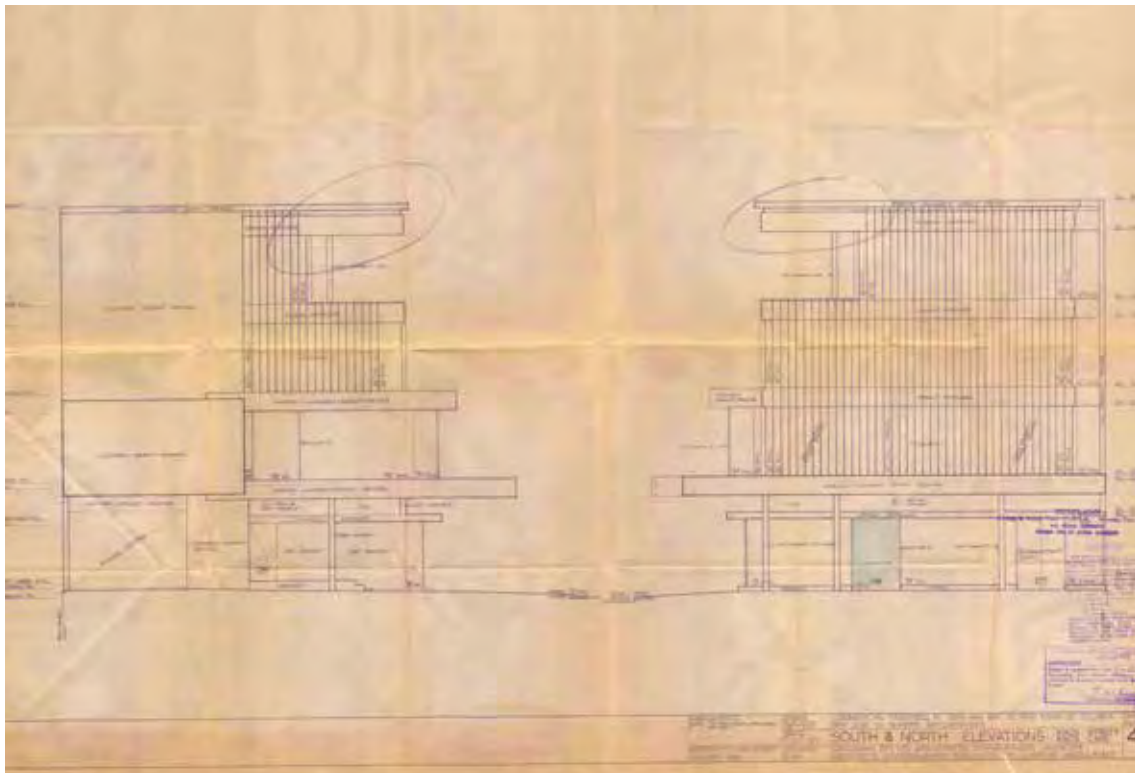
| *The Knox Lane (north) and Knox Street (south) elevations of the Gruzman design. The north elevation - as built - does not feature the external blades. (Source: BA 1546/1971)
